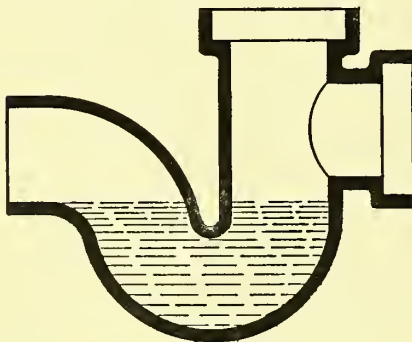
Intercepting Trap for Fixing in a Line of Drain Pipes
